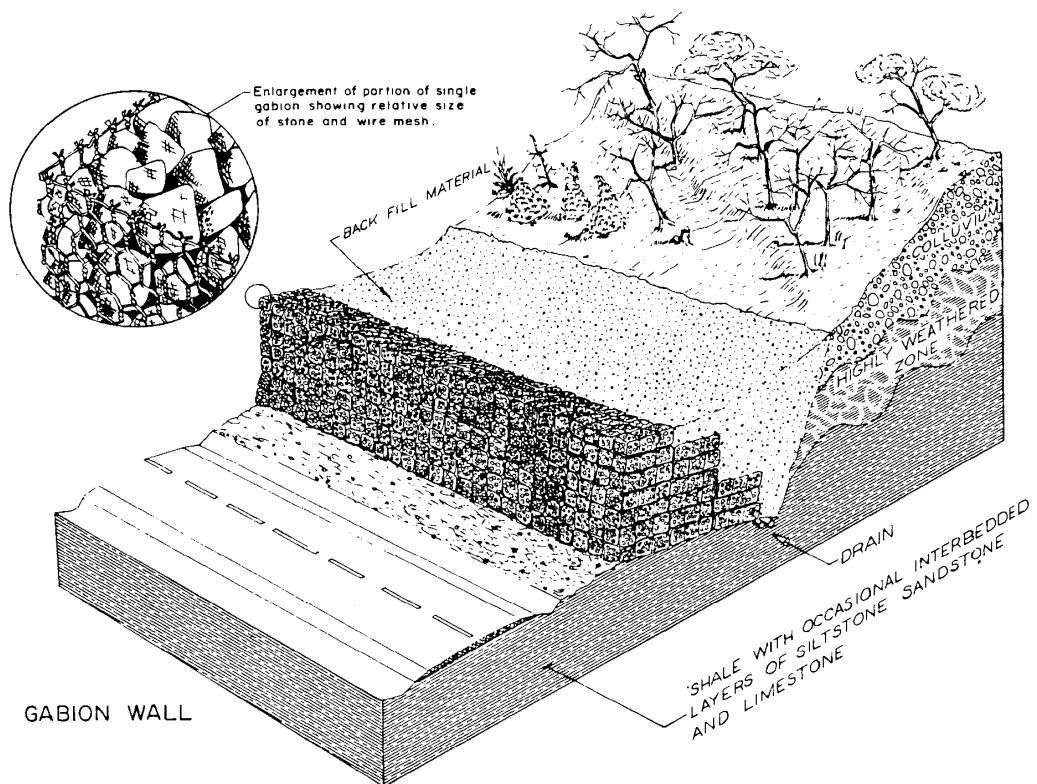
Schematic of a gabion wall. (Royster, 1982)
